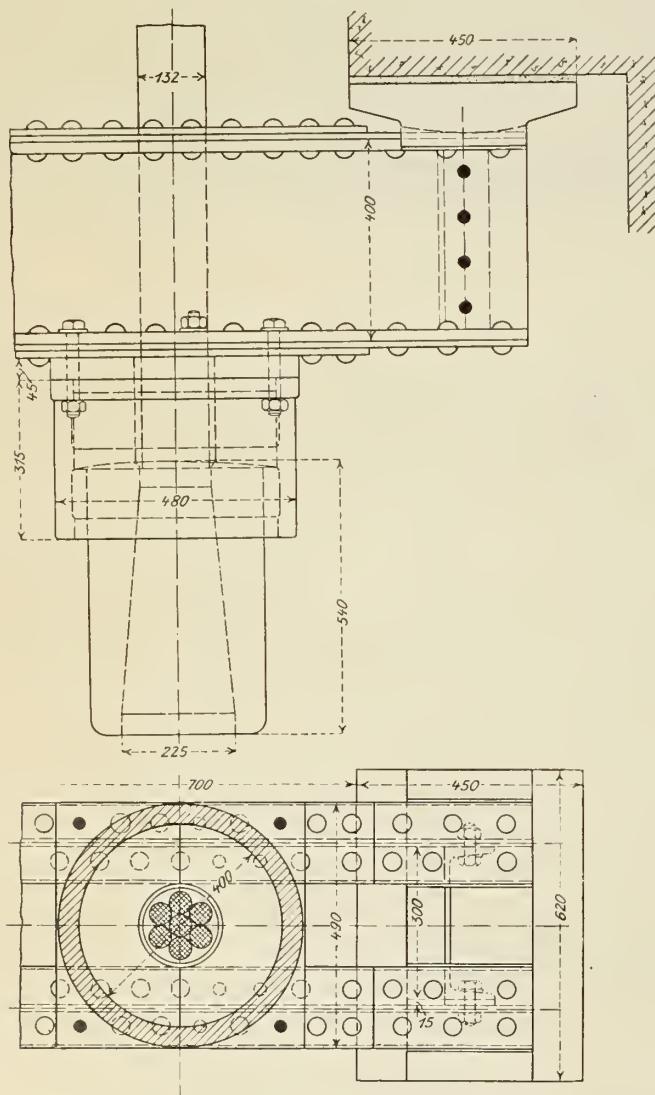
Langenargen Bridge. Anchorage of cable. (Dimensions in millimetres.)
